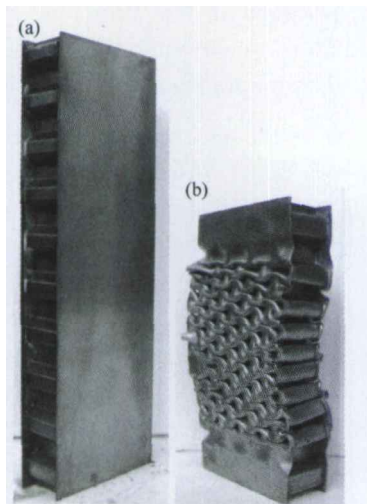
Shapes of the specimen T3 before and after testing: (a) undeformed shape before testing; (b) deformed shape after testing.
